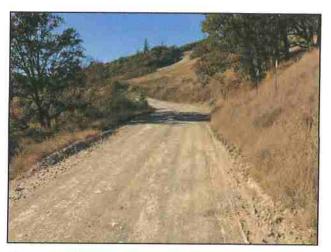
River Rd Looking NW @ Curve w/ Pullout
